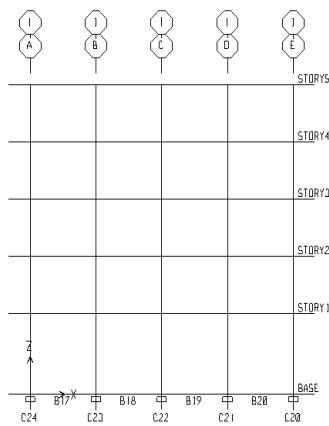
(a): Elevation of models neglecting the stiffness of walls
